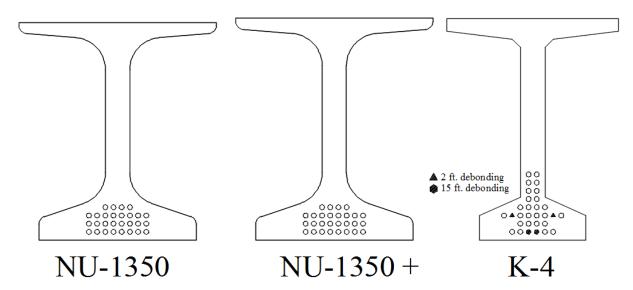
NU-1350 and K-4 Girder Strand Patterns (Straight Strands) at a Design Span of 90 ft
